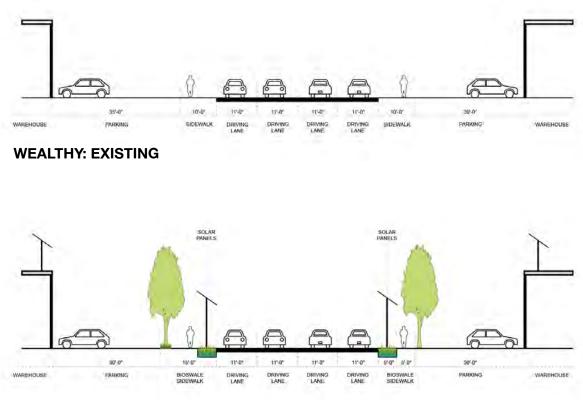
Wealthy Street river connection: existing and proposed sections
